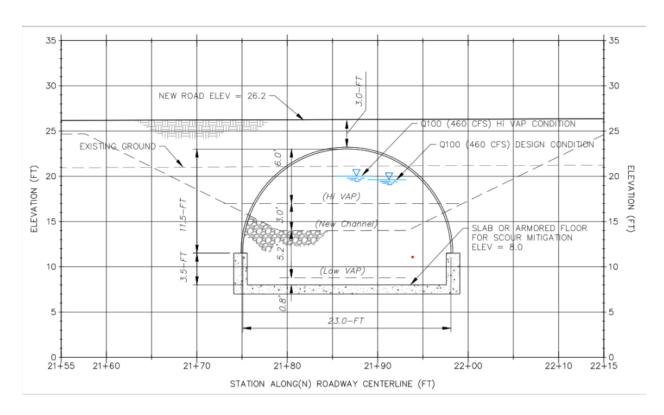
Culvert design cross section for Lower Bear Creek crossing at Lighthouse Road. Michael Love & Associates, 2022.
